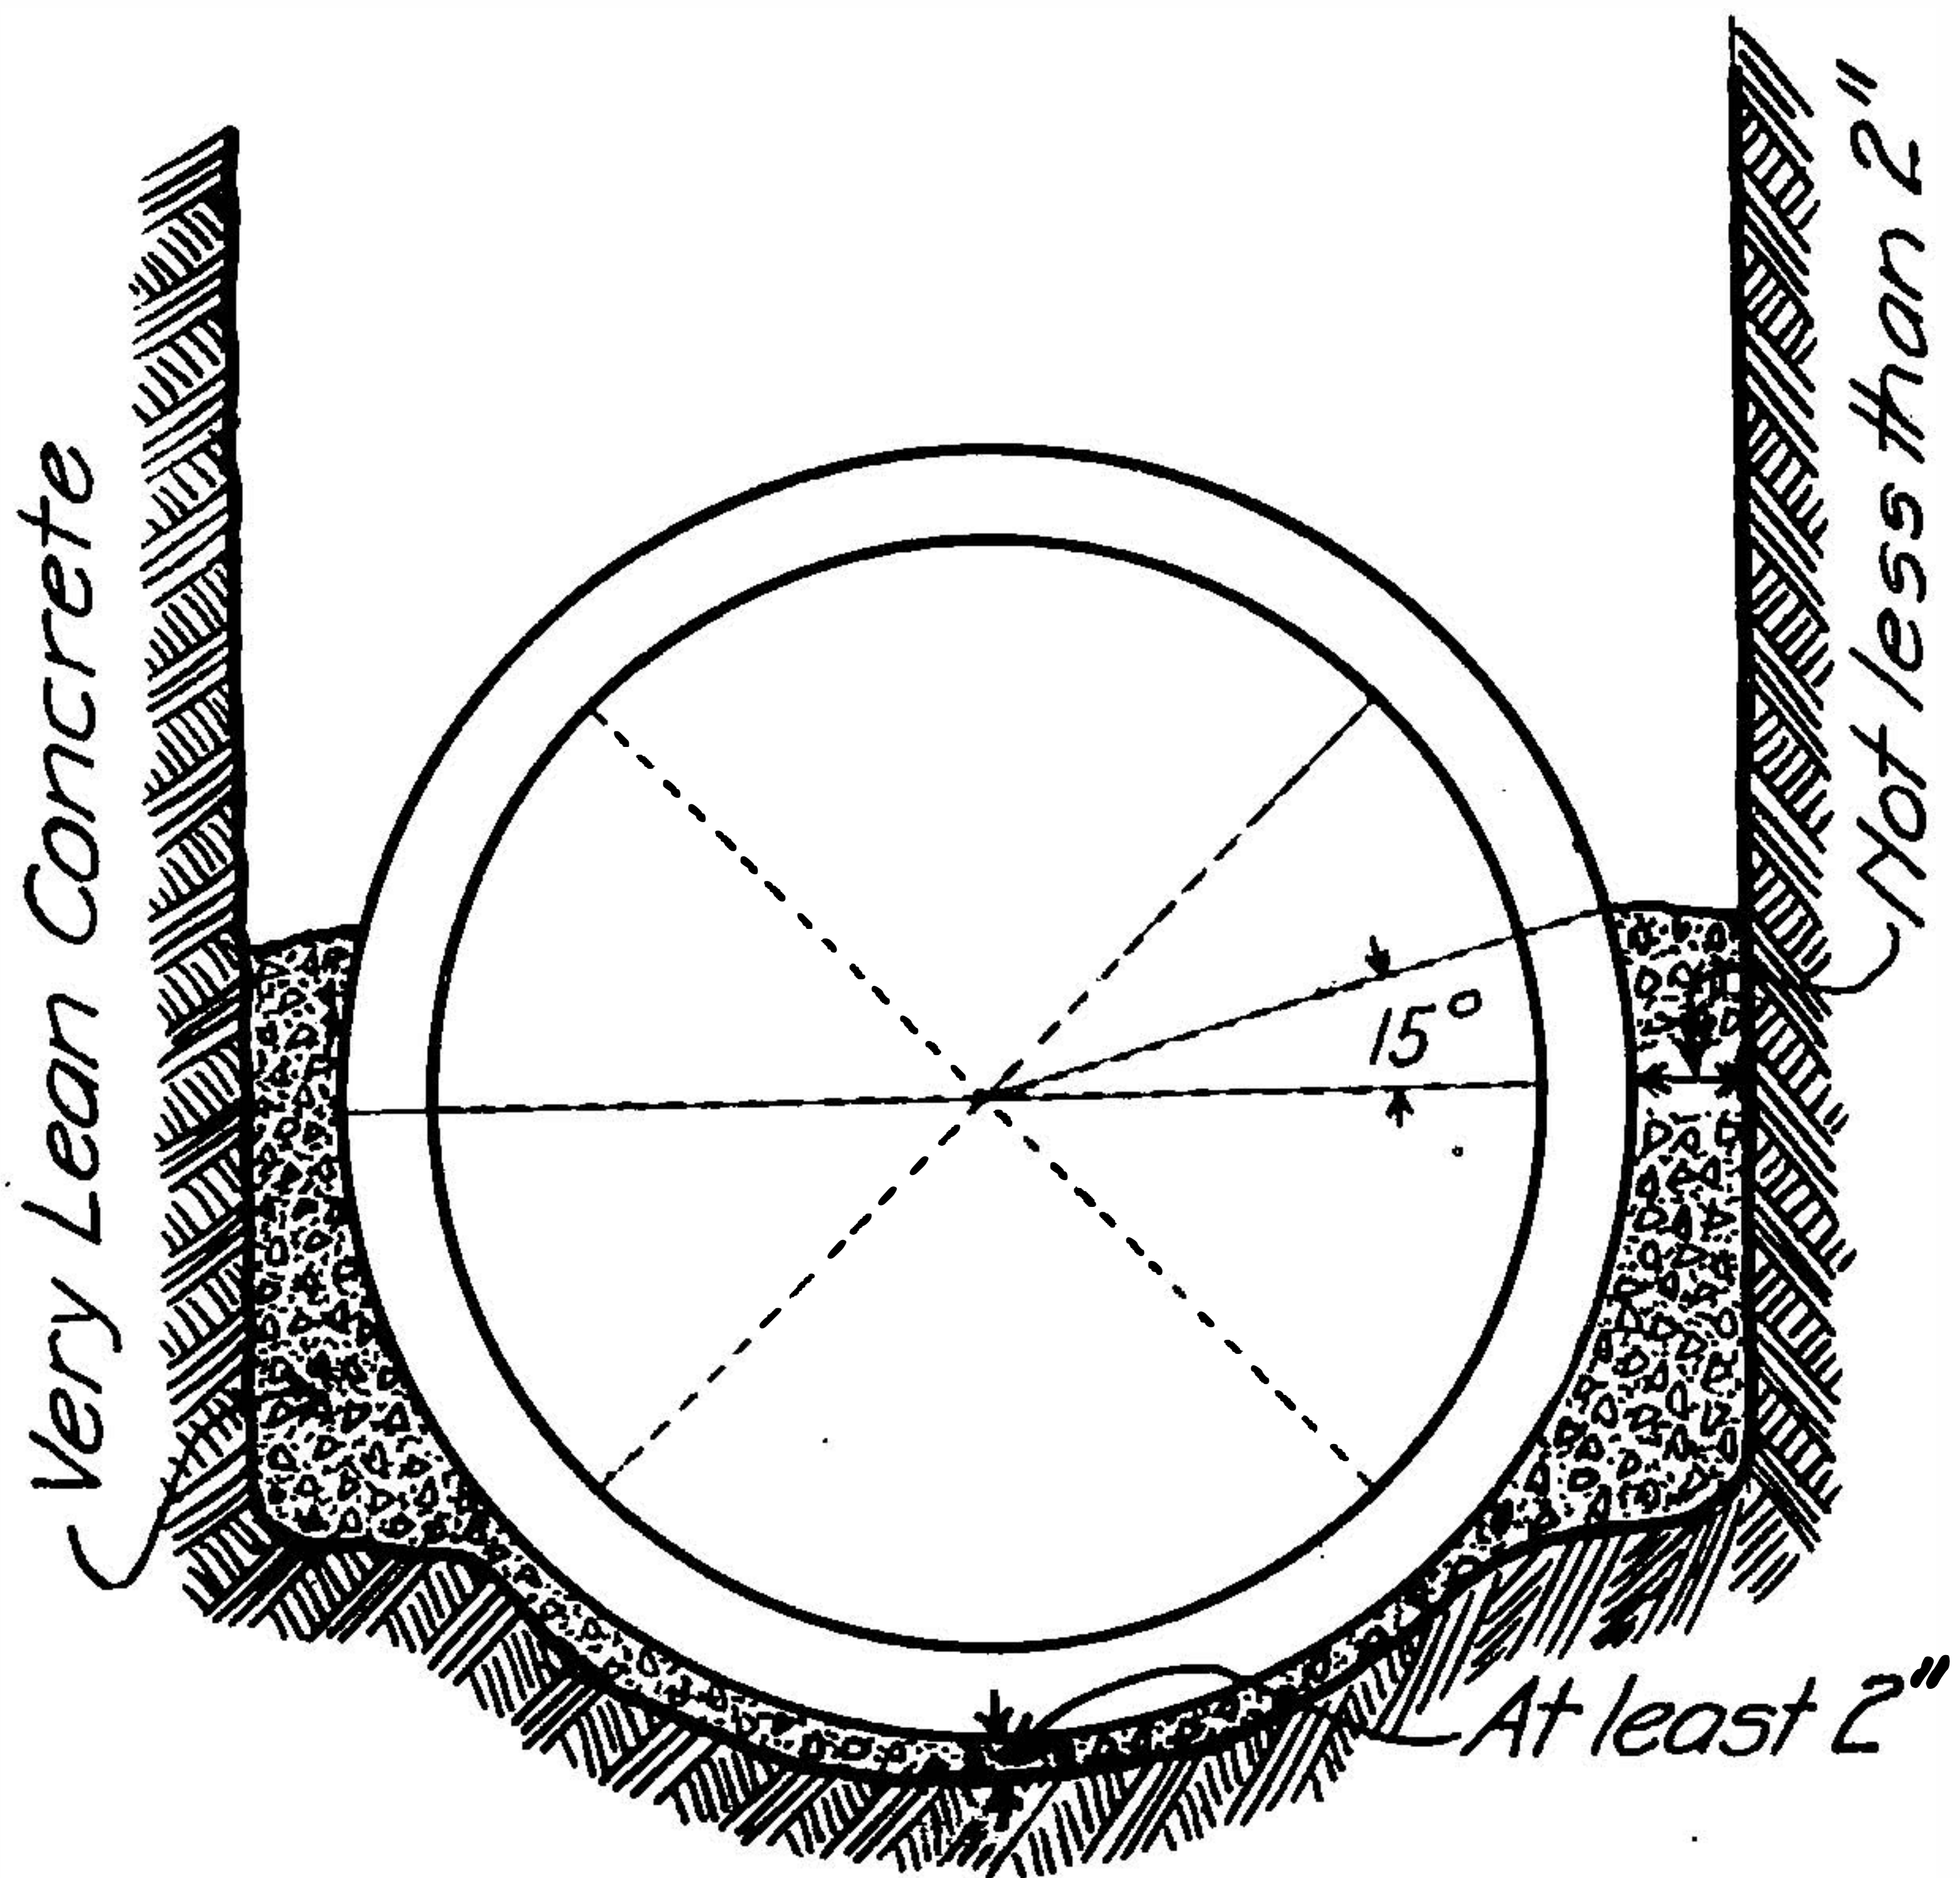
Method of Strengthening Drain Tile and Sewer Pipe to Carry Heavy Loads, by Bedding in Concrete, in Solid Soils.
